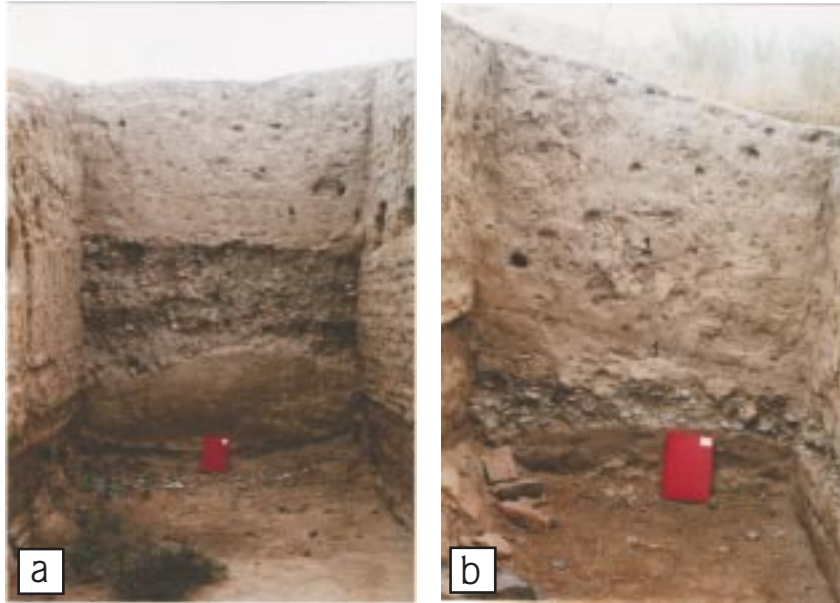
In-fill (“zabutovka”) strengthening of the walls for protection against possible collapse. (a) Filling-in of external temple corridor; (b) “Zabutovka” along the external wall of the Buddhist temple. Here its thickness is 1 m maximum (near the wall). The top of the artificial embankment is marked by a horizon of organic material 1–3 cm in thickness (1). Above is a layer 1.0–1.2 m in thickness, a product of the destruction of the SW external wall of the temple: *saman* bricks and their fragments (2).
